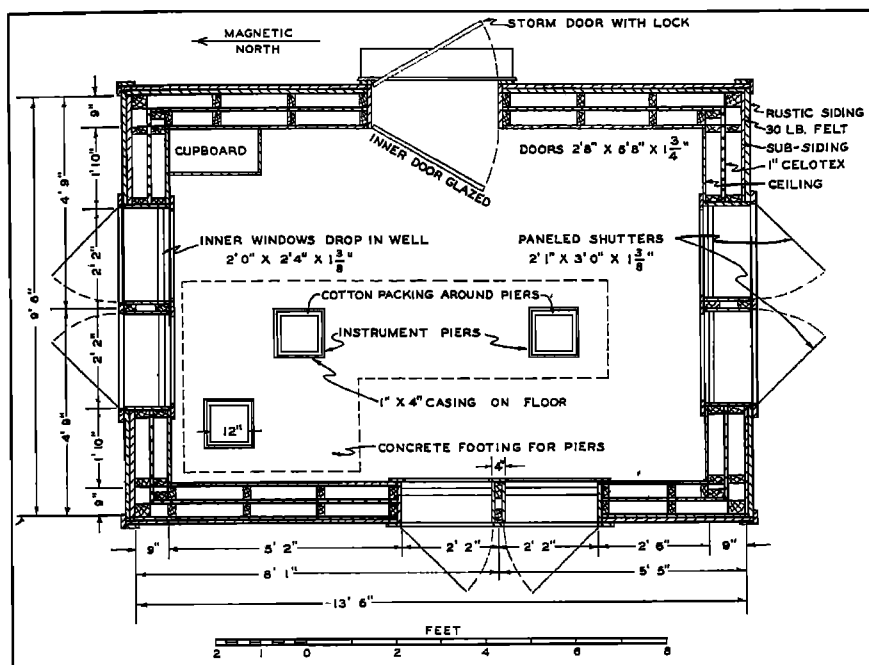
FLOOR-PLAN OF MAGNETIC ABSOLUTE BUILDING
